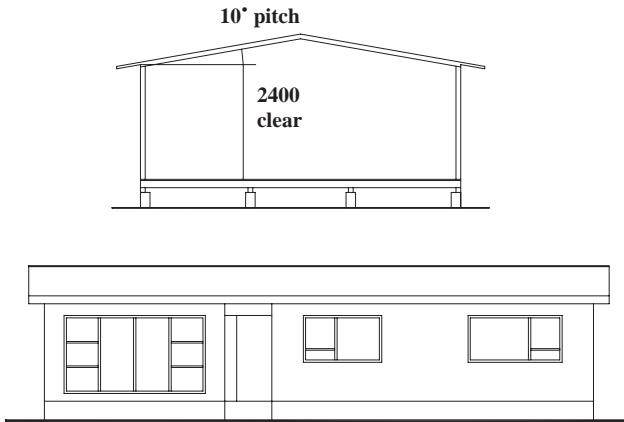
Section and front elevation of BIAC standard house for NZ.
